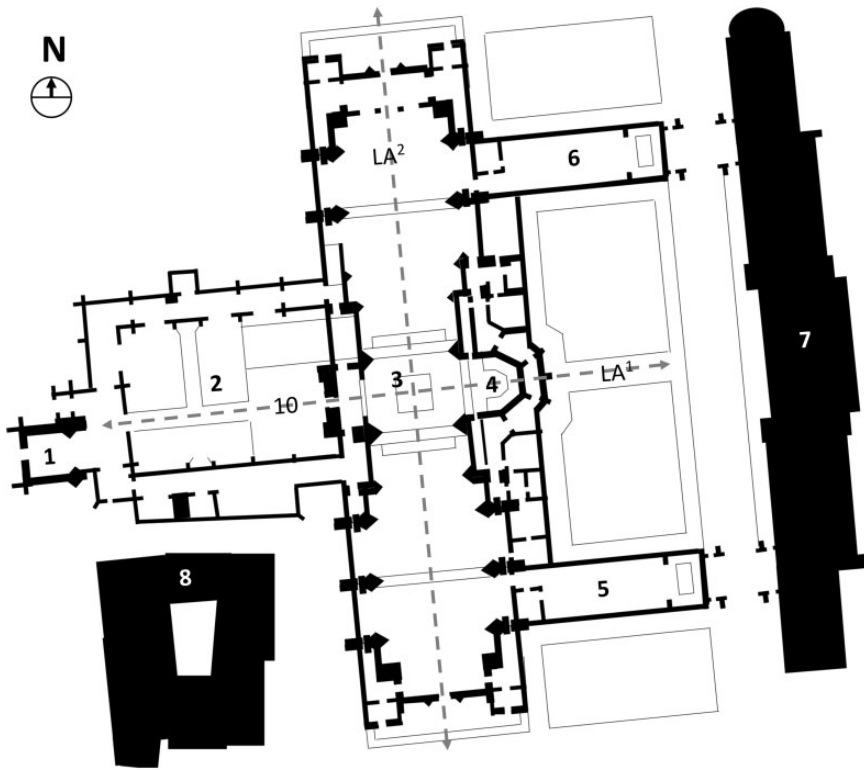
Diagrammatic floor plan of Giles Gilbert Scott's plan of 1944.
